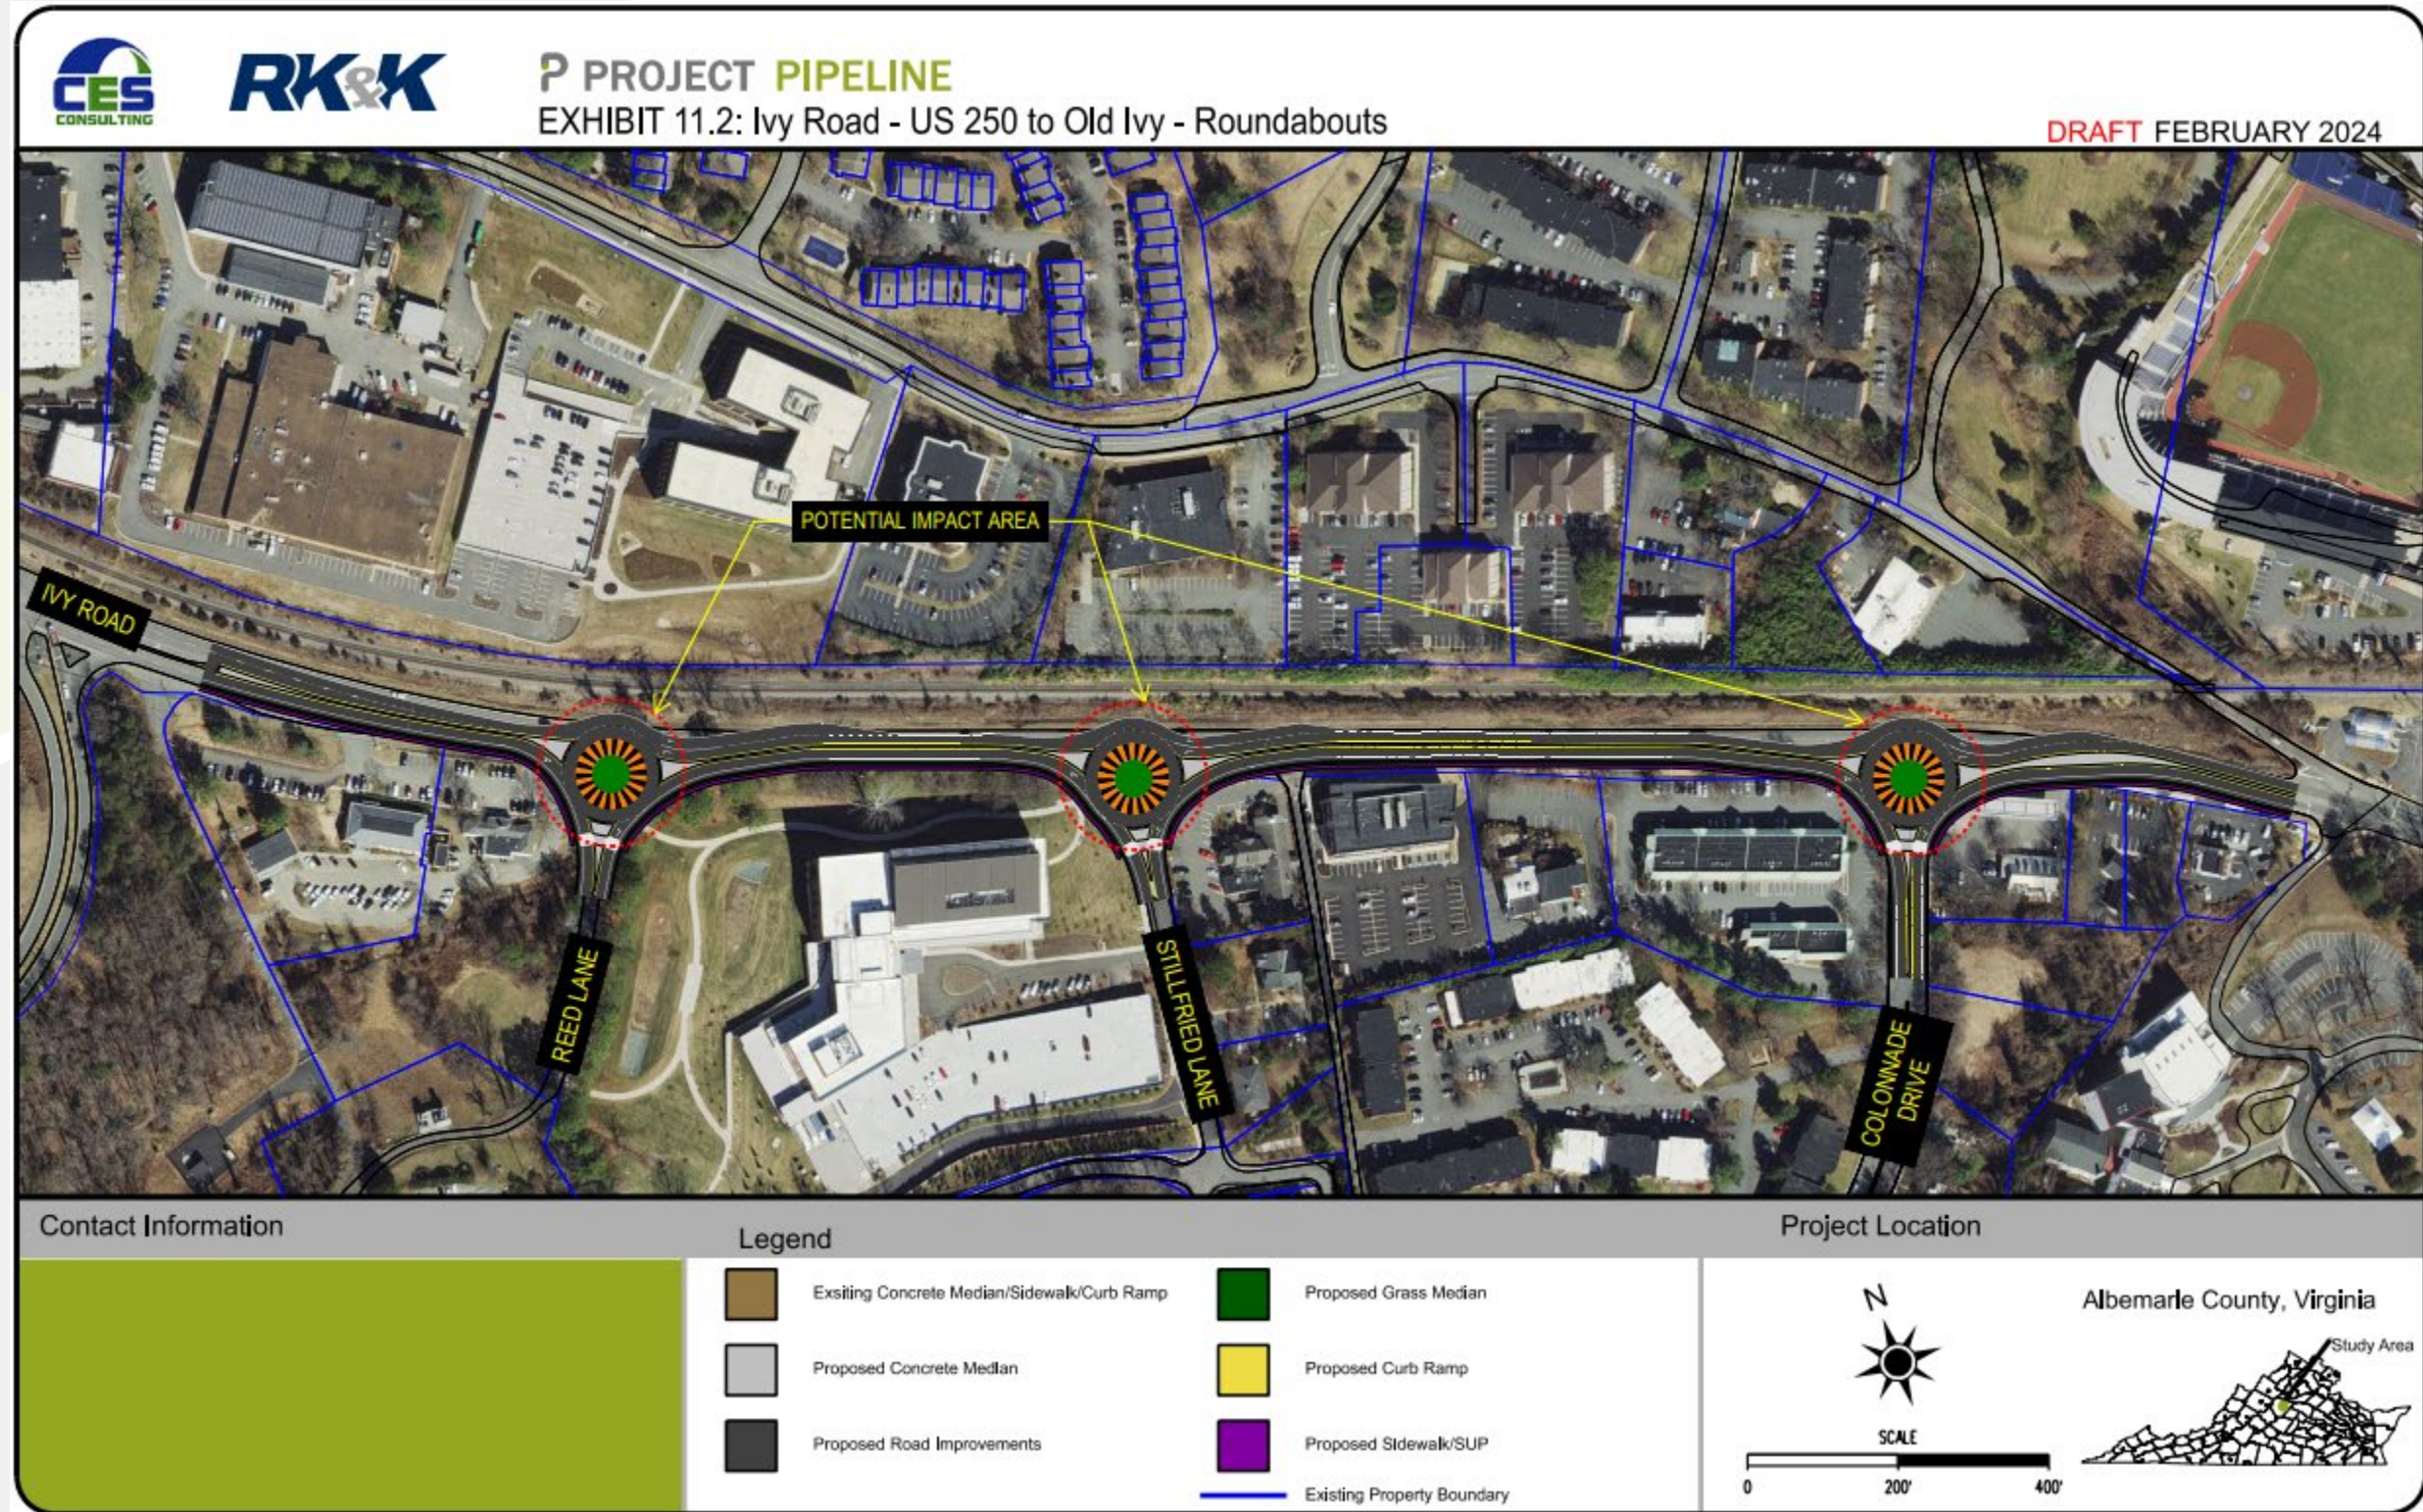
Ivy Road – Layout for Roundabouts From US 250 to Old Ivy Road
